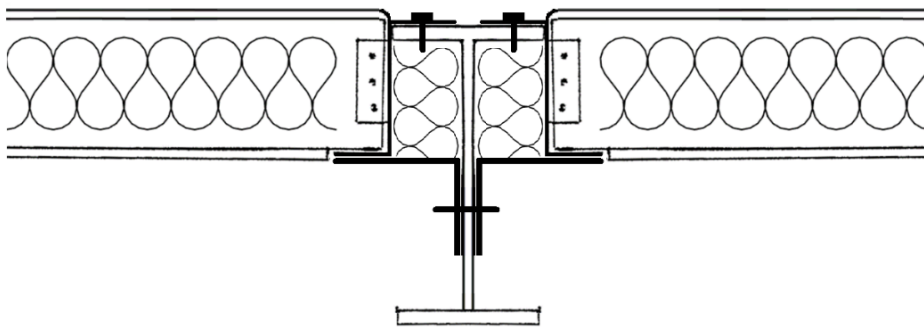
Use of pre-fabricated insulated suspended roof or floor cassette [41]
